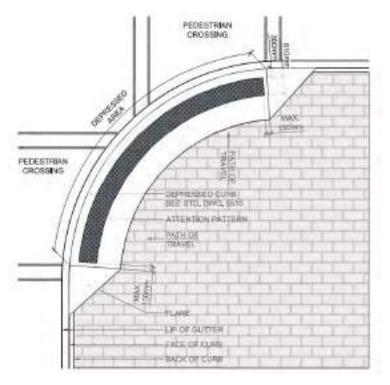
Tactile Warning Surface Indicator Layout, Full Radius Curb Ramp
